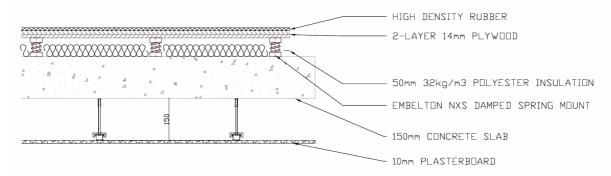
Damped springs with 2-layers, 14mm plywood and top surface rubber build-up
